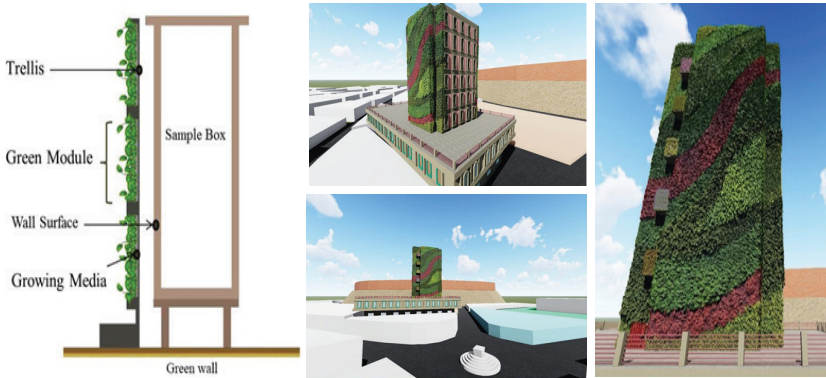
Main constructive details and perspectives of the suggested concept green wall
